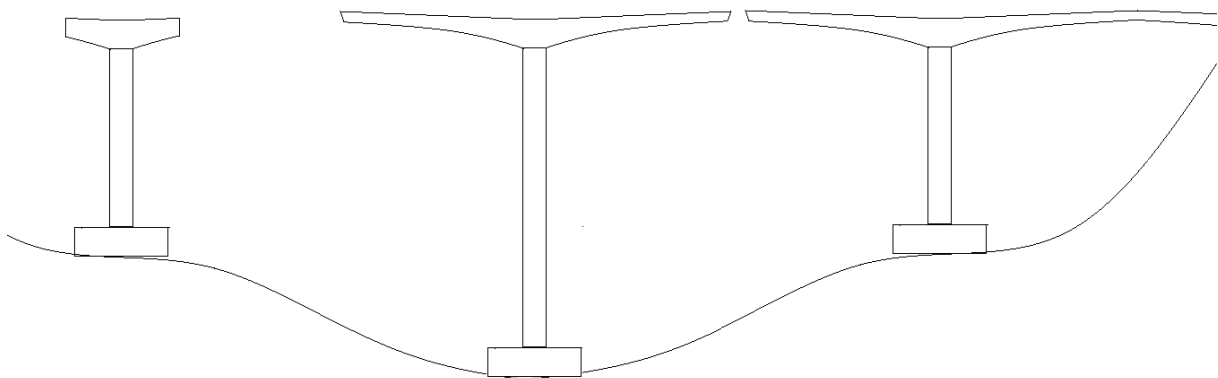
Construction process of cast in-situ balanced cantilever bridge.
